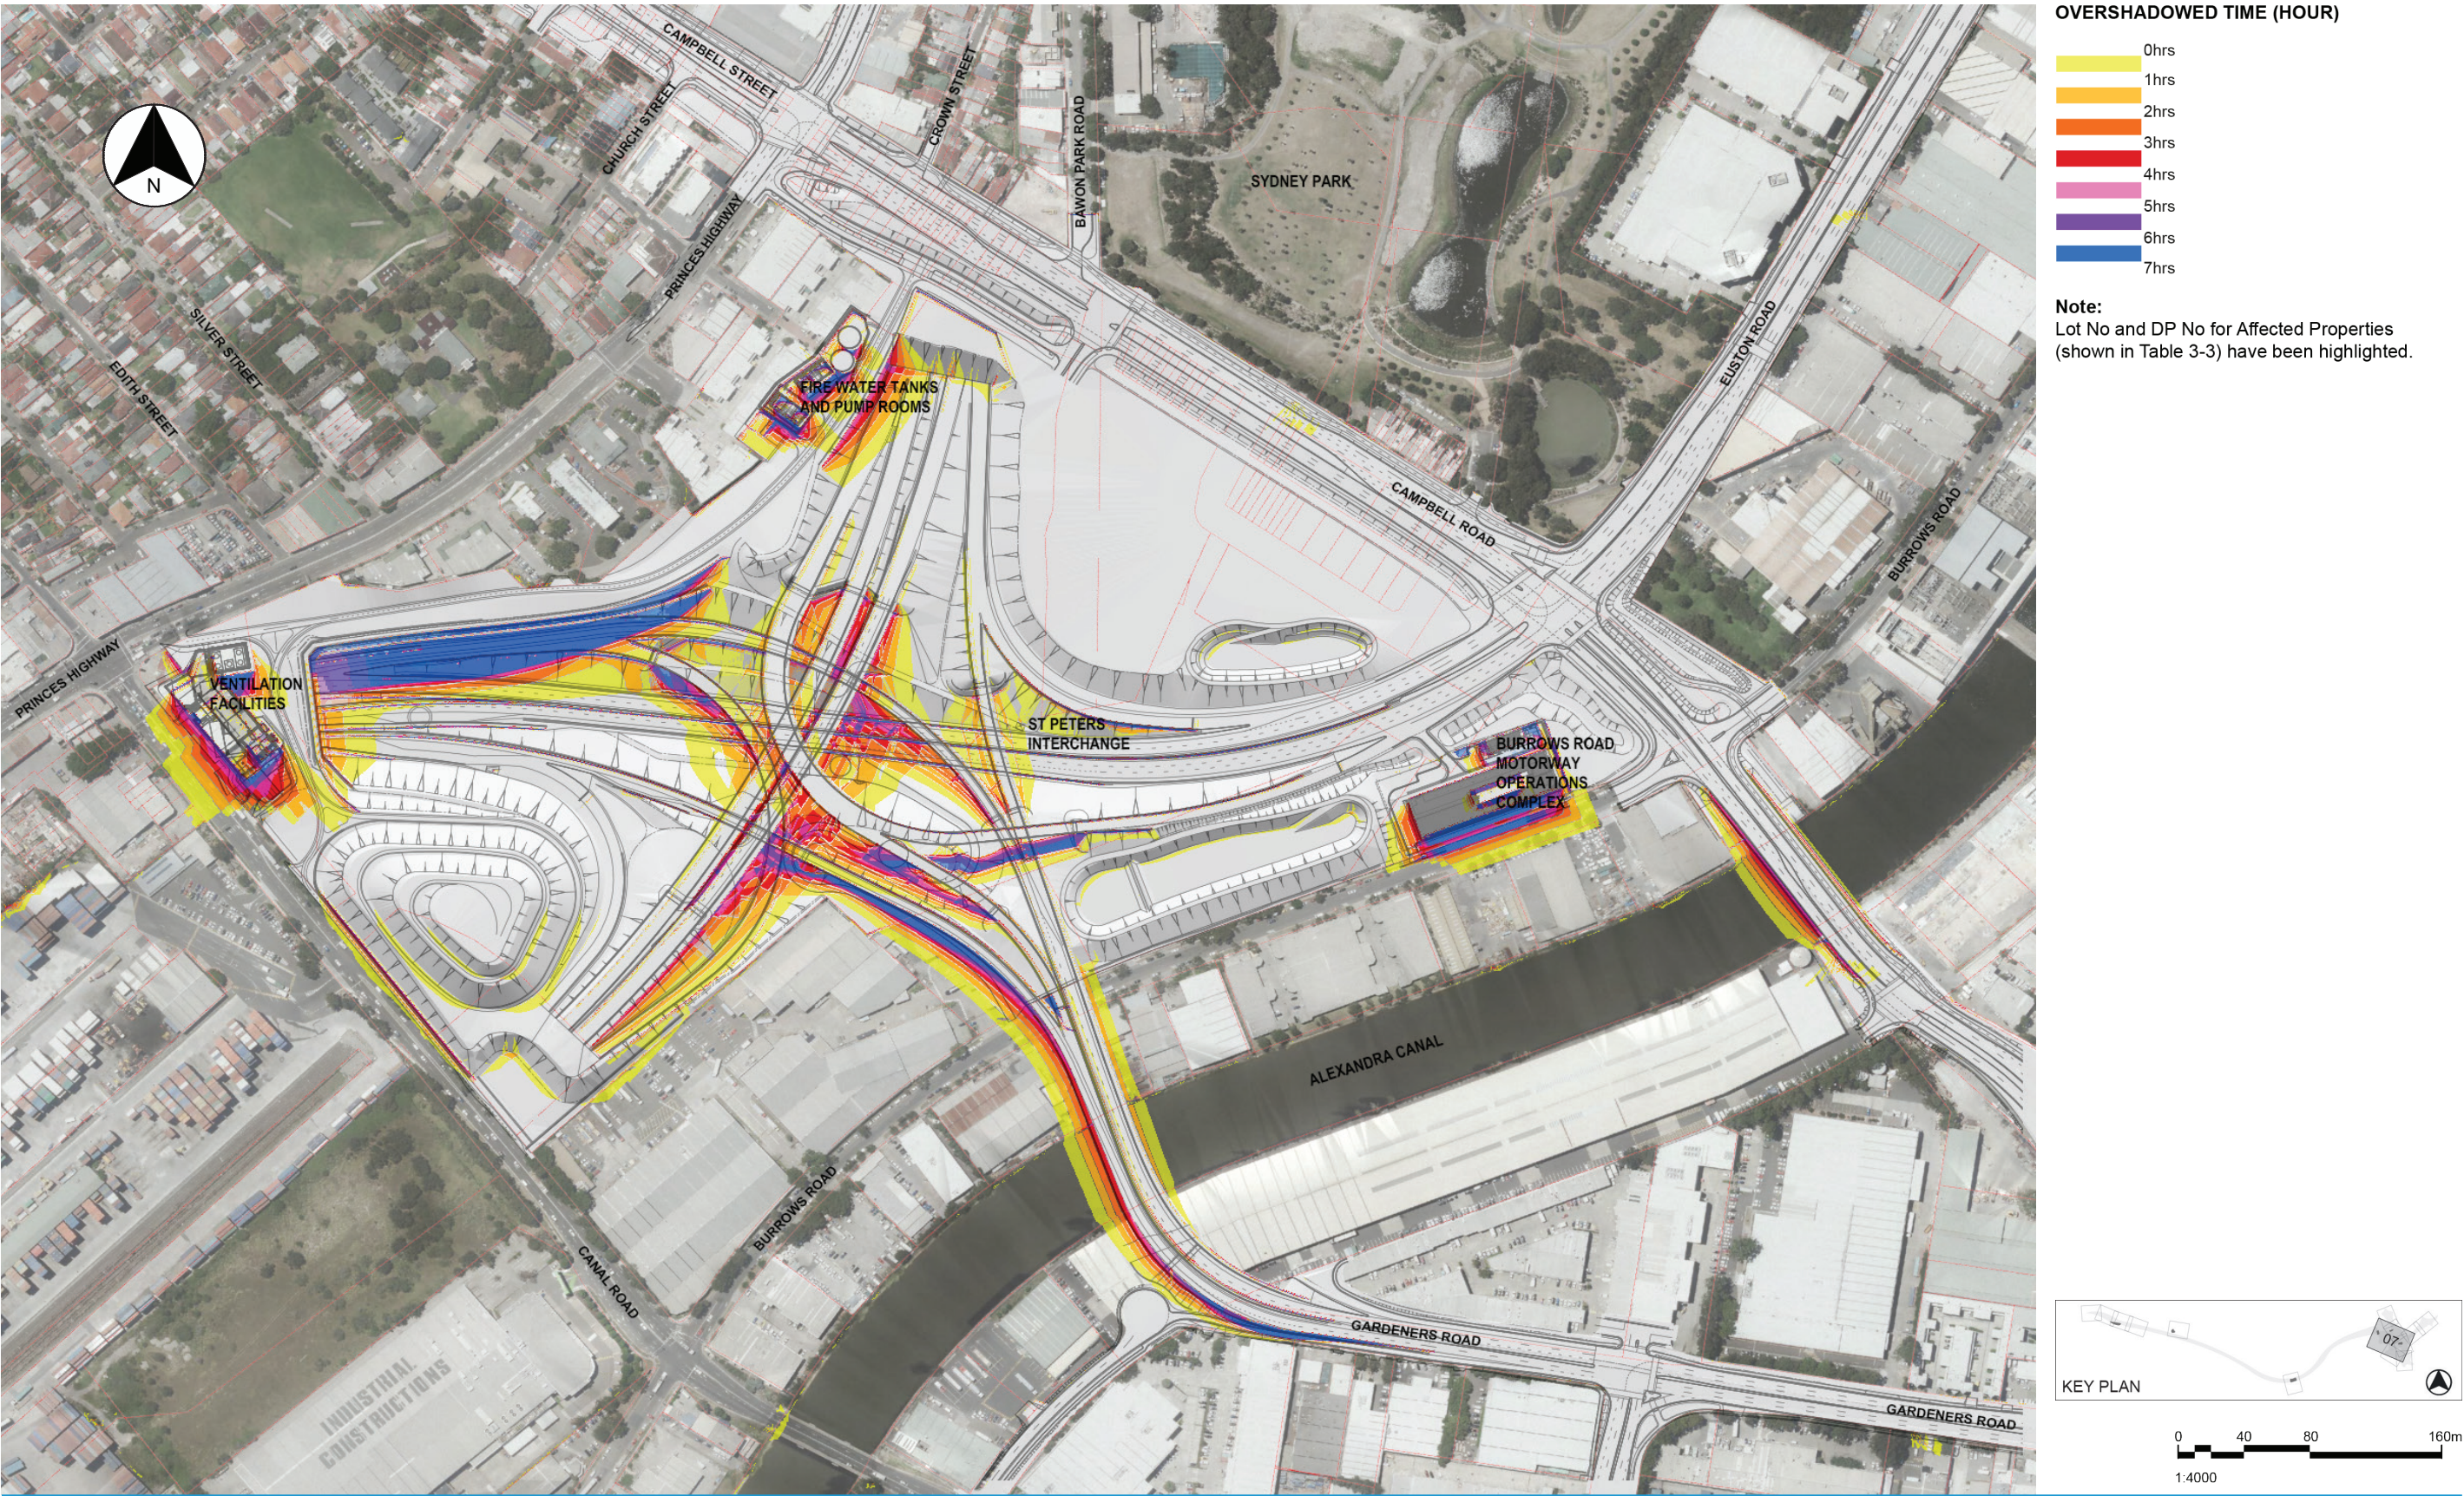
Overshadowing Assessment Plan - Sheet 7 of 14 - 1:4000
